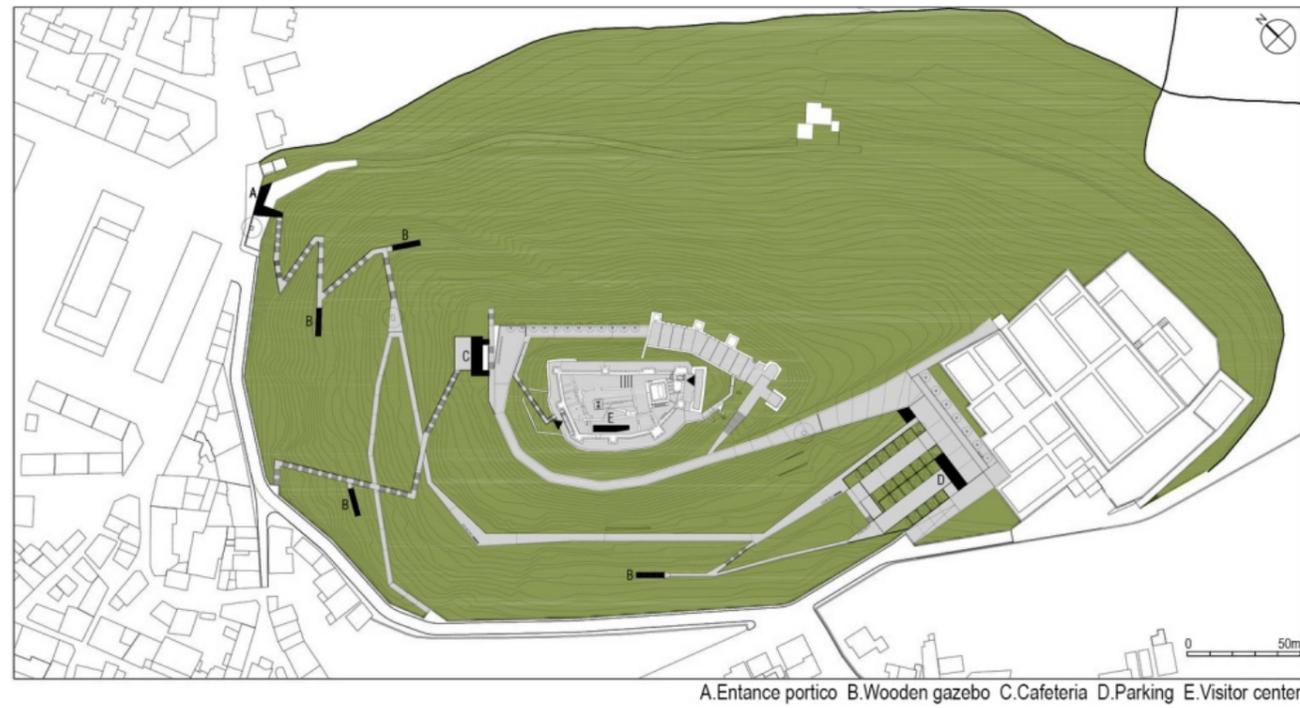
Site plan of Pombal Castle (Source: Pereira, 2019)
